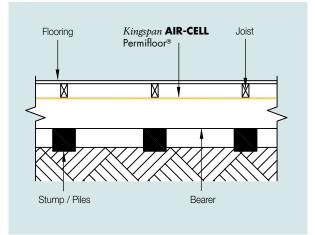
Side elevation of *Kingspan* AIR-CELL Permifloor[®] in a suspended framed floor
